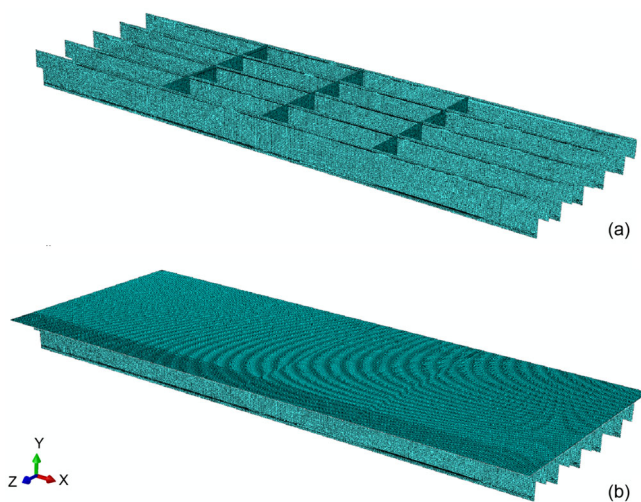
3D view of the FE bridge model: (a) central span beam grid and (b) central span deck slab supported by the beam grid.
